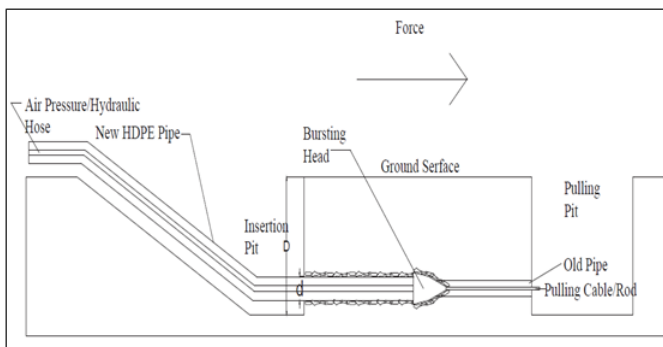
Pipe bursting layout (Plastic Pipe Institute, 2008)
